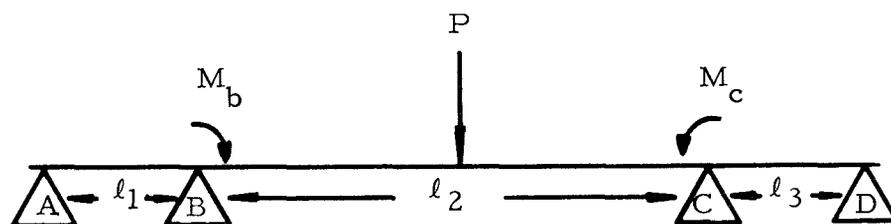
Plywood loading diagram for overlapping plywood test samples.
